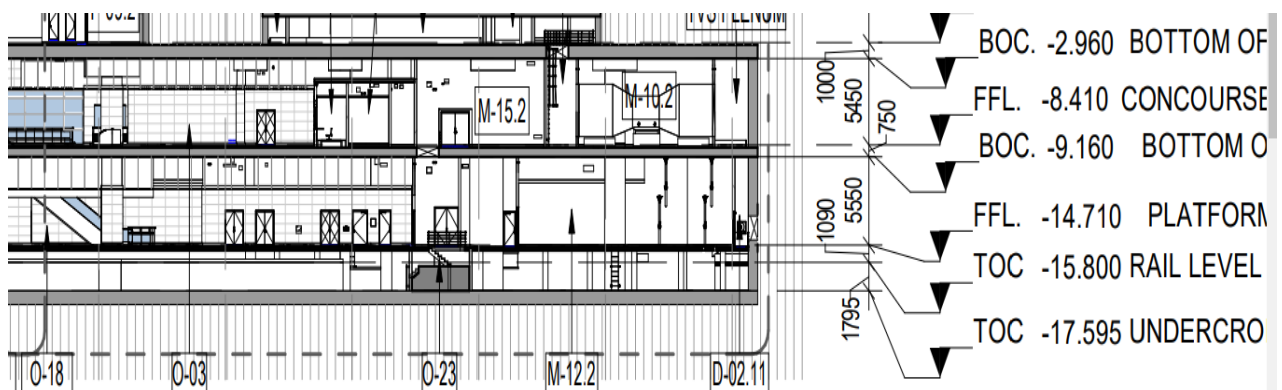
Layout (Sectional) of a typical Underground Metro Undercroft Level
